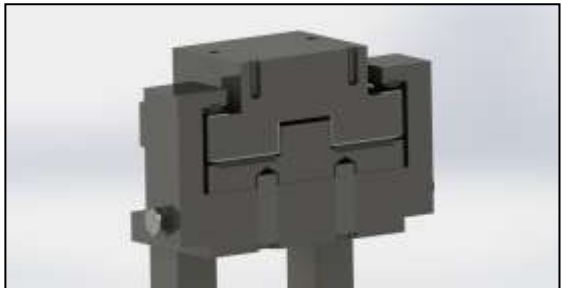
Section of bearing shown in Figure 14. The rocker element of the fixed bearing in Figures 12 and 13 is replaced by a two-part unit, the top part of which slides across the lower part, along one axis.
